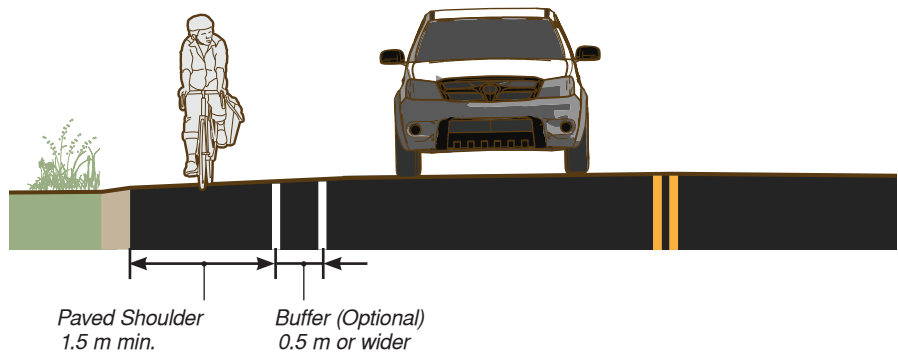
Preferred minimum widths for a paved shoulder. Image adapted from FHWA Small Town and Rural Multimodal Network Design Guide.
